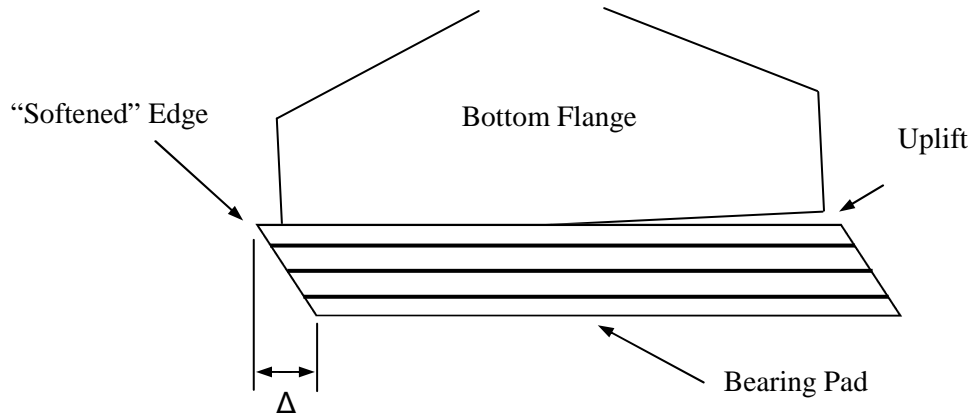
“Softened” bearing pad edge due to bearing pad shear deformation
